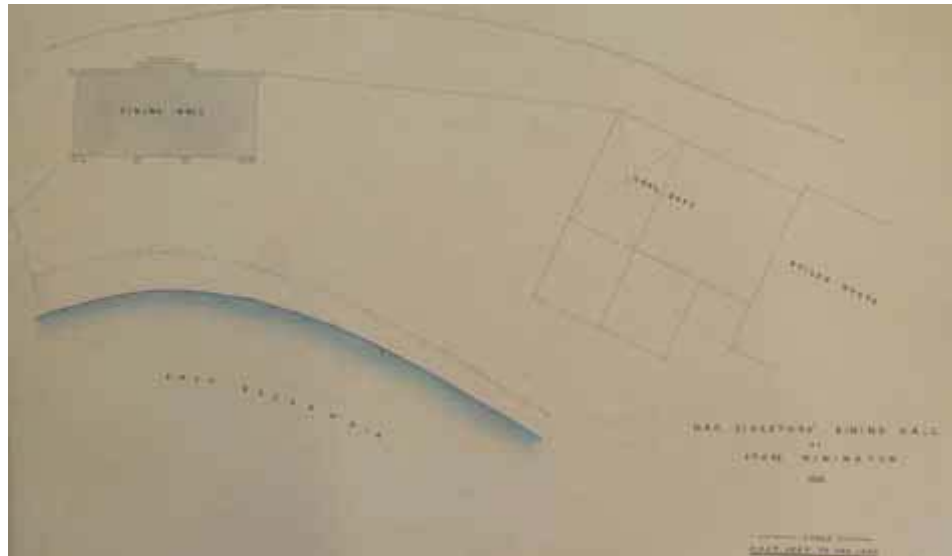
1866 Dining Hall plan, Gas House as Coal Store (North to right of image)
